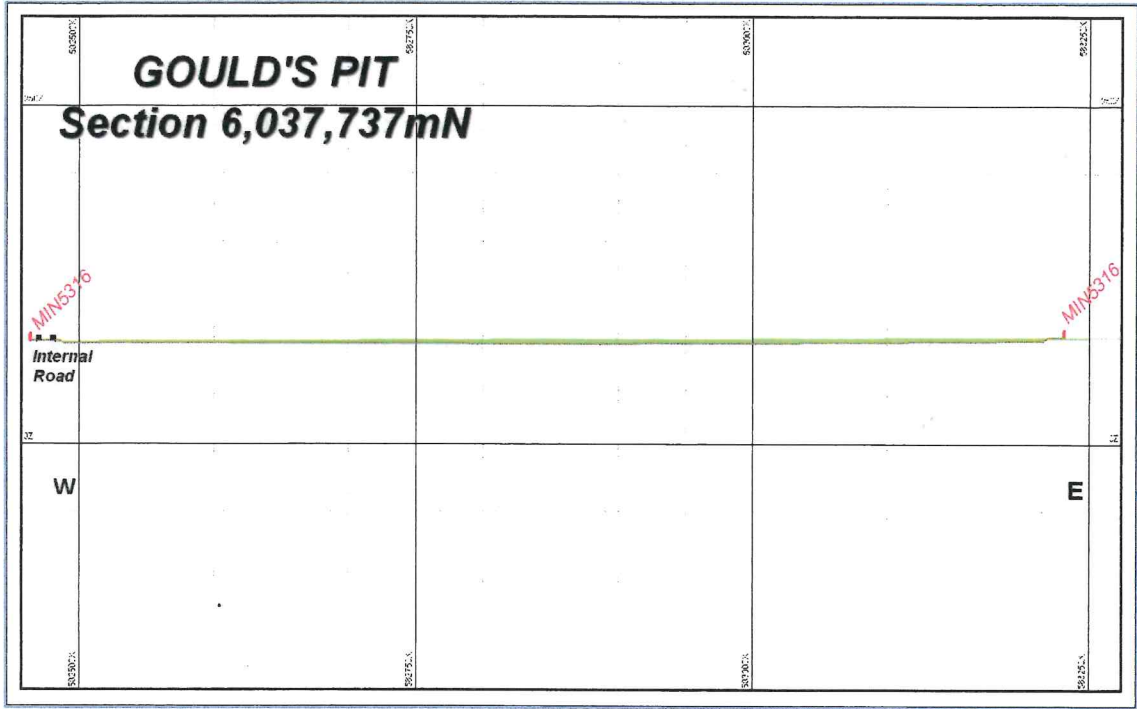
Transverse Section thru Proposed Gould's Pit (6,037,737mN).
